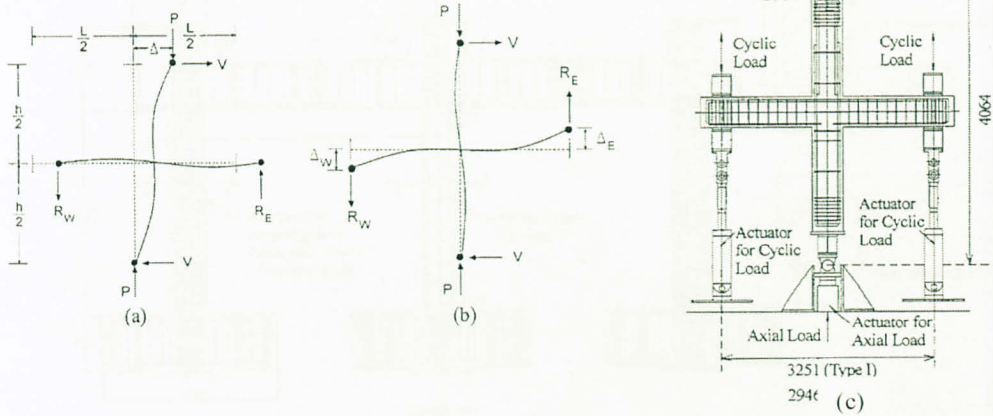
(a) Idealized joint; (b) joint tested in the laboratory; (c) experimental setup of beam-column test (Source: Pantelides, et al., 2008)
